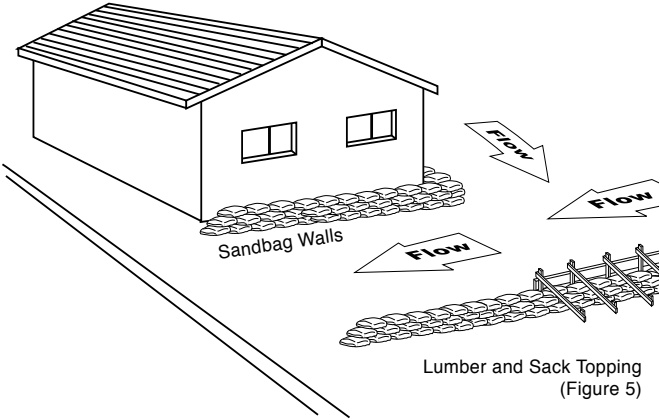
To divert mud, debris, and water, use sandbag walls or lumber and sack topping
